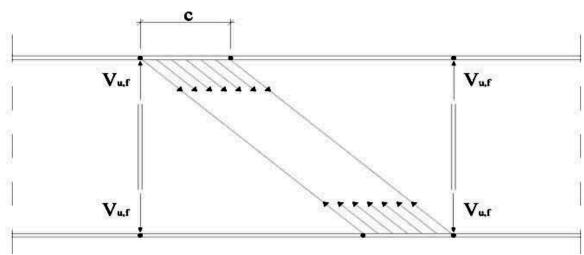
SHEAR FORCE CARRIED BY TRUSS ACTION
